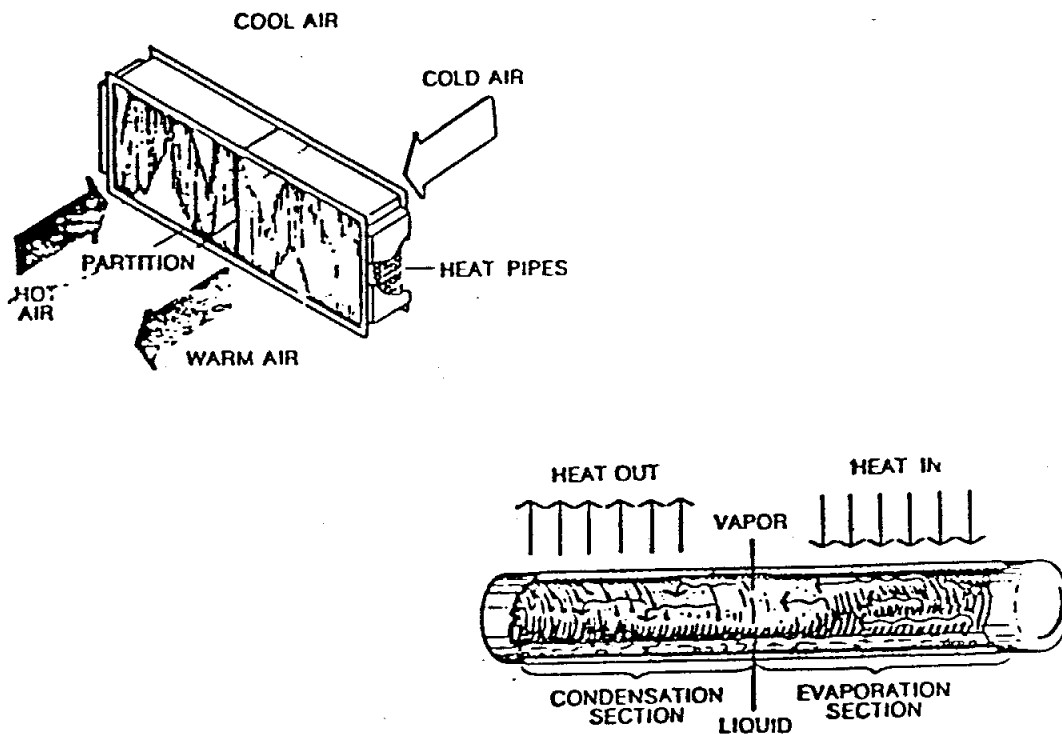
TYPICAL HEAT PIPE CONFIGURATION
